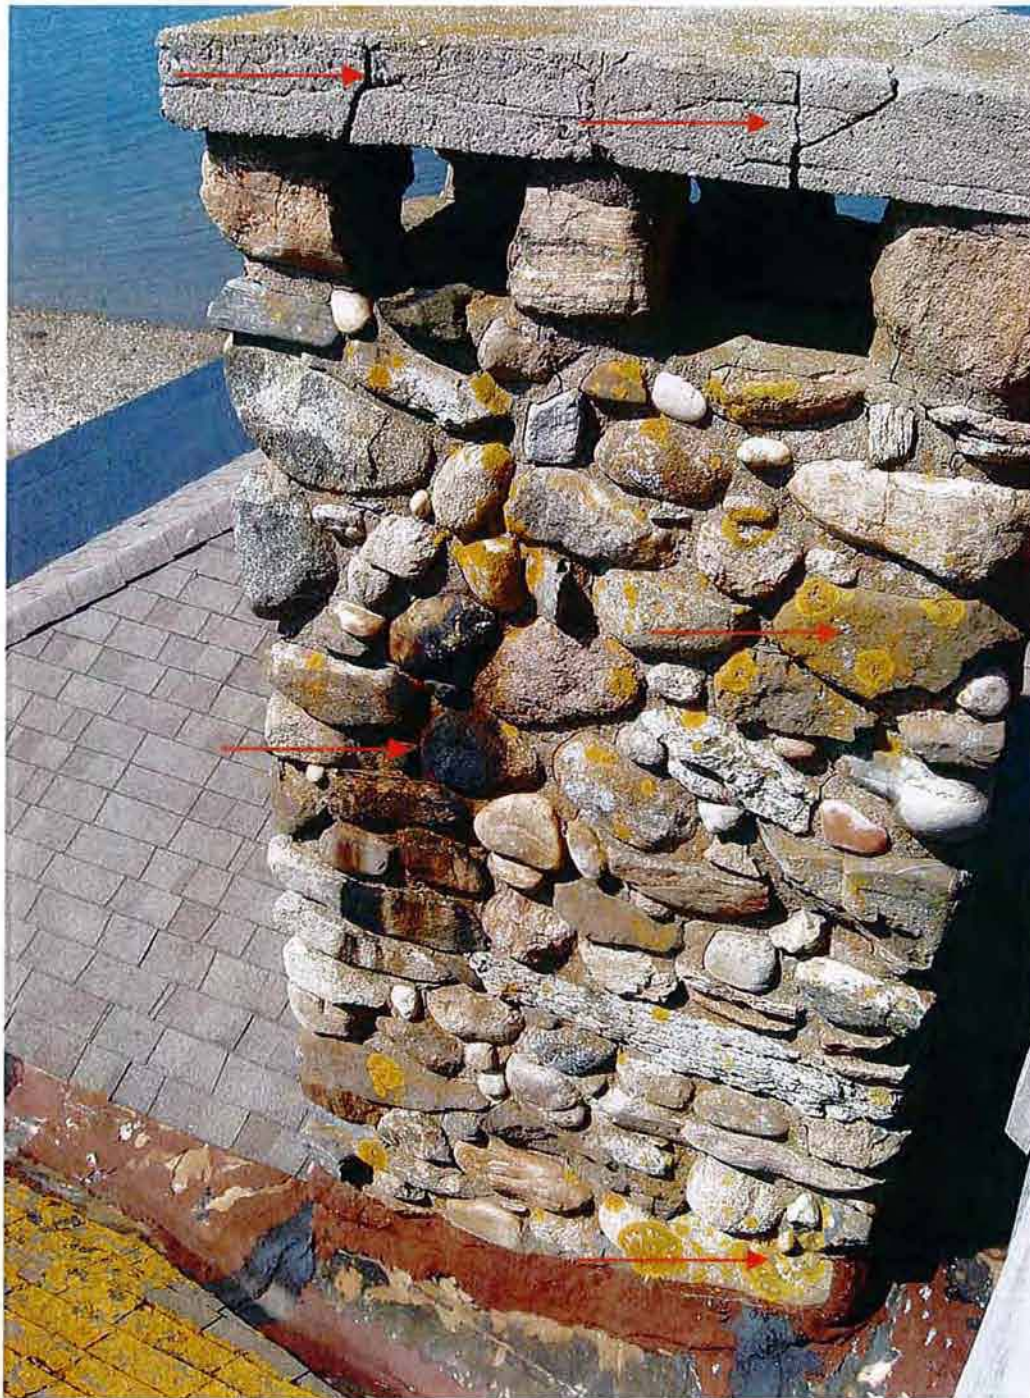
Large stone chimney. This chimney is associated with the original building. Its concrete cap is cracked. The build-up of bio-growth on the concrete cap and on the face of the chimney is an indication of excessive moisture. A new concrete cap will be installed, as well as repointing and new flashing.
